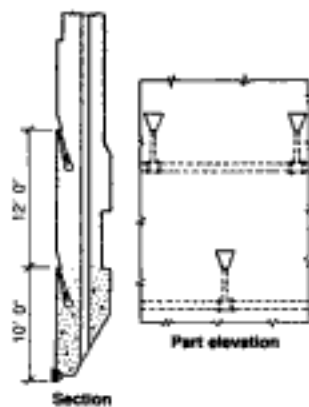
Baton Rouge Bridge: two-tier jetting arrangement (Blaine²¹)
